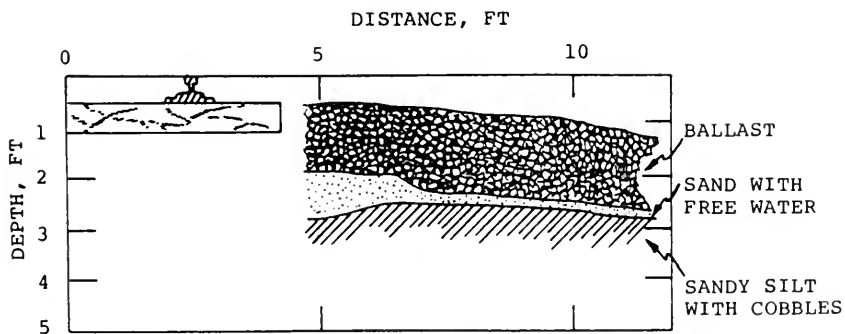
Transverse Cross Section at Site 1, Cross-Hole 1
